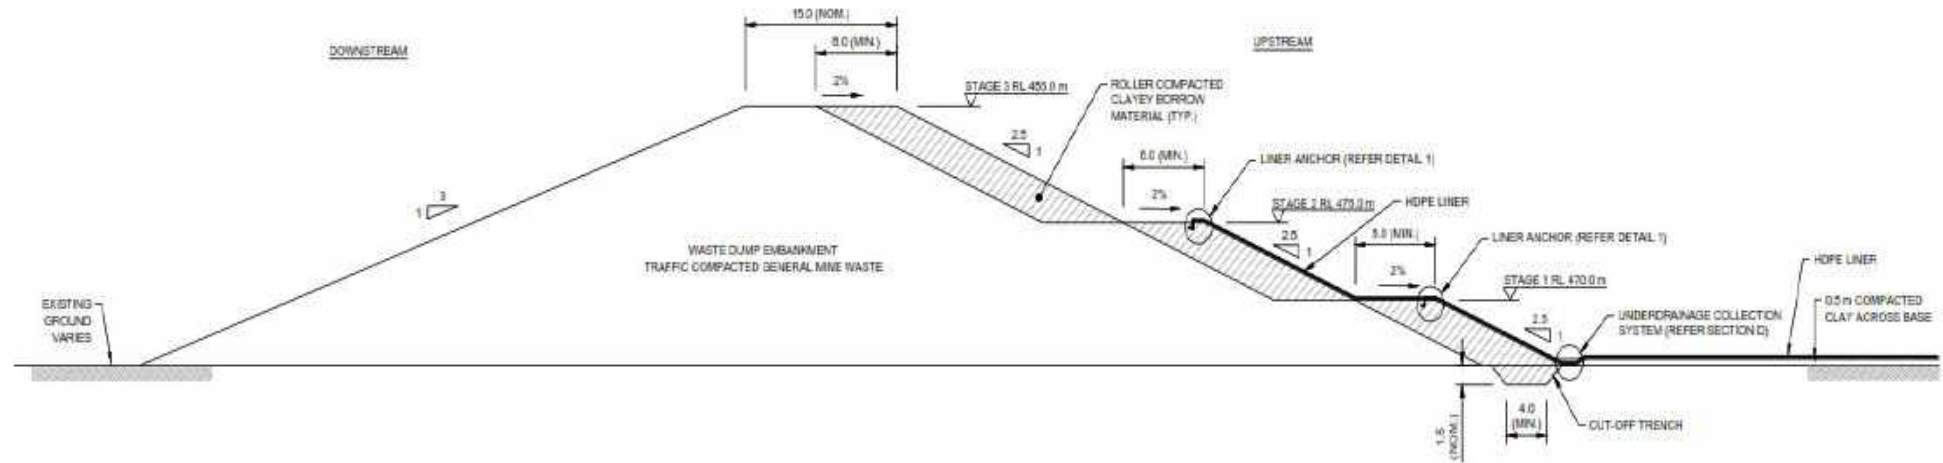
Tailing cell perimeter embankment – typical cross section.
